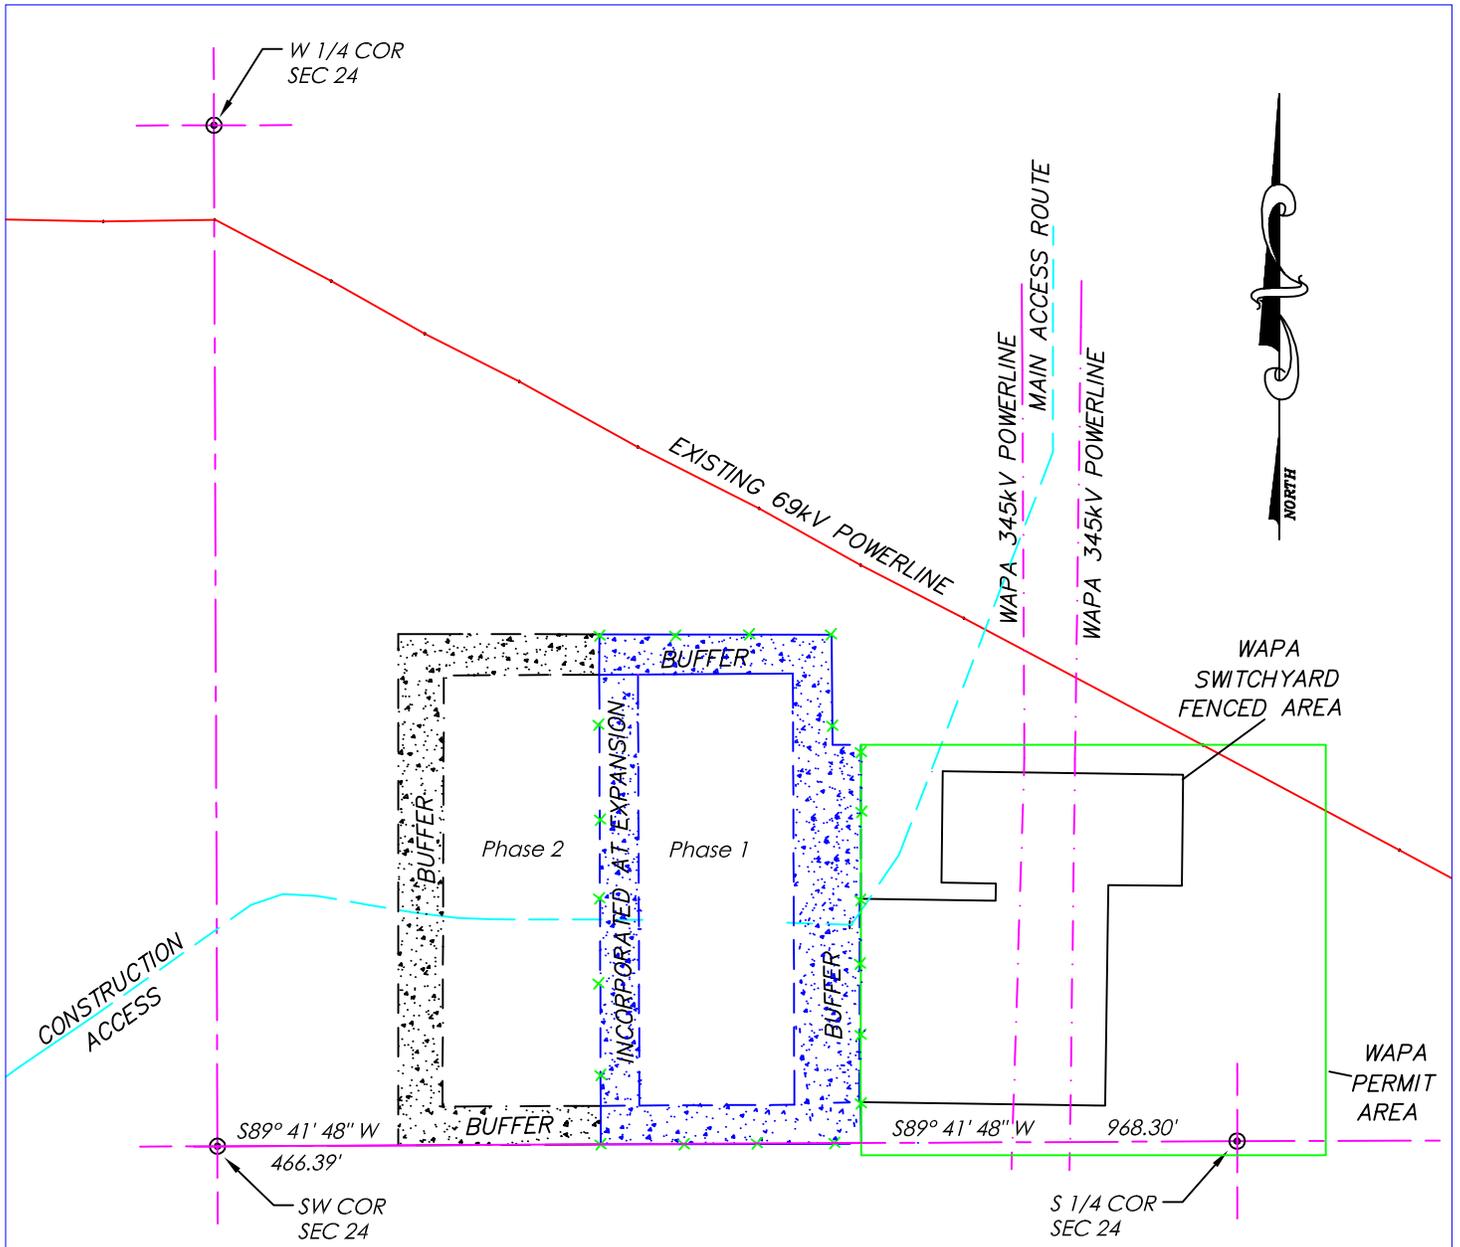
Detail of proposed substation site in relation to existing WAPA 345kV switchyard.
